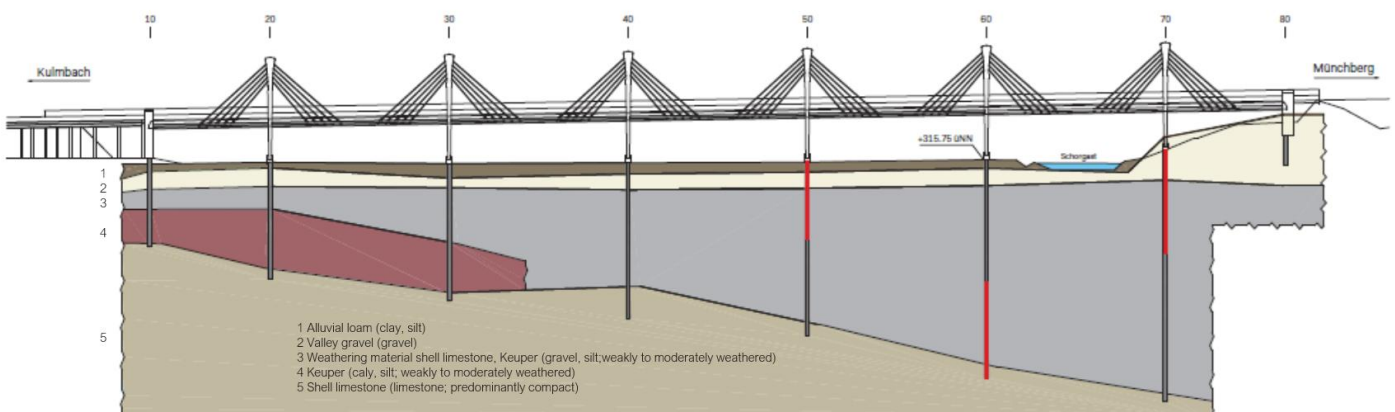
Longitudinal Section showing subsoil Conditions, inflated
